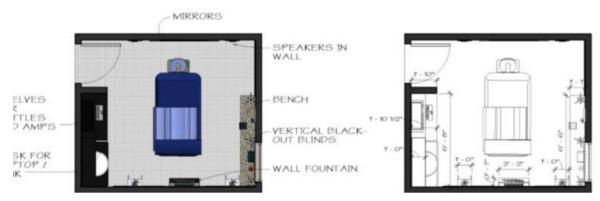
SHOWS MASSAGE ROOM PLAN
